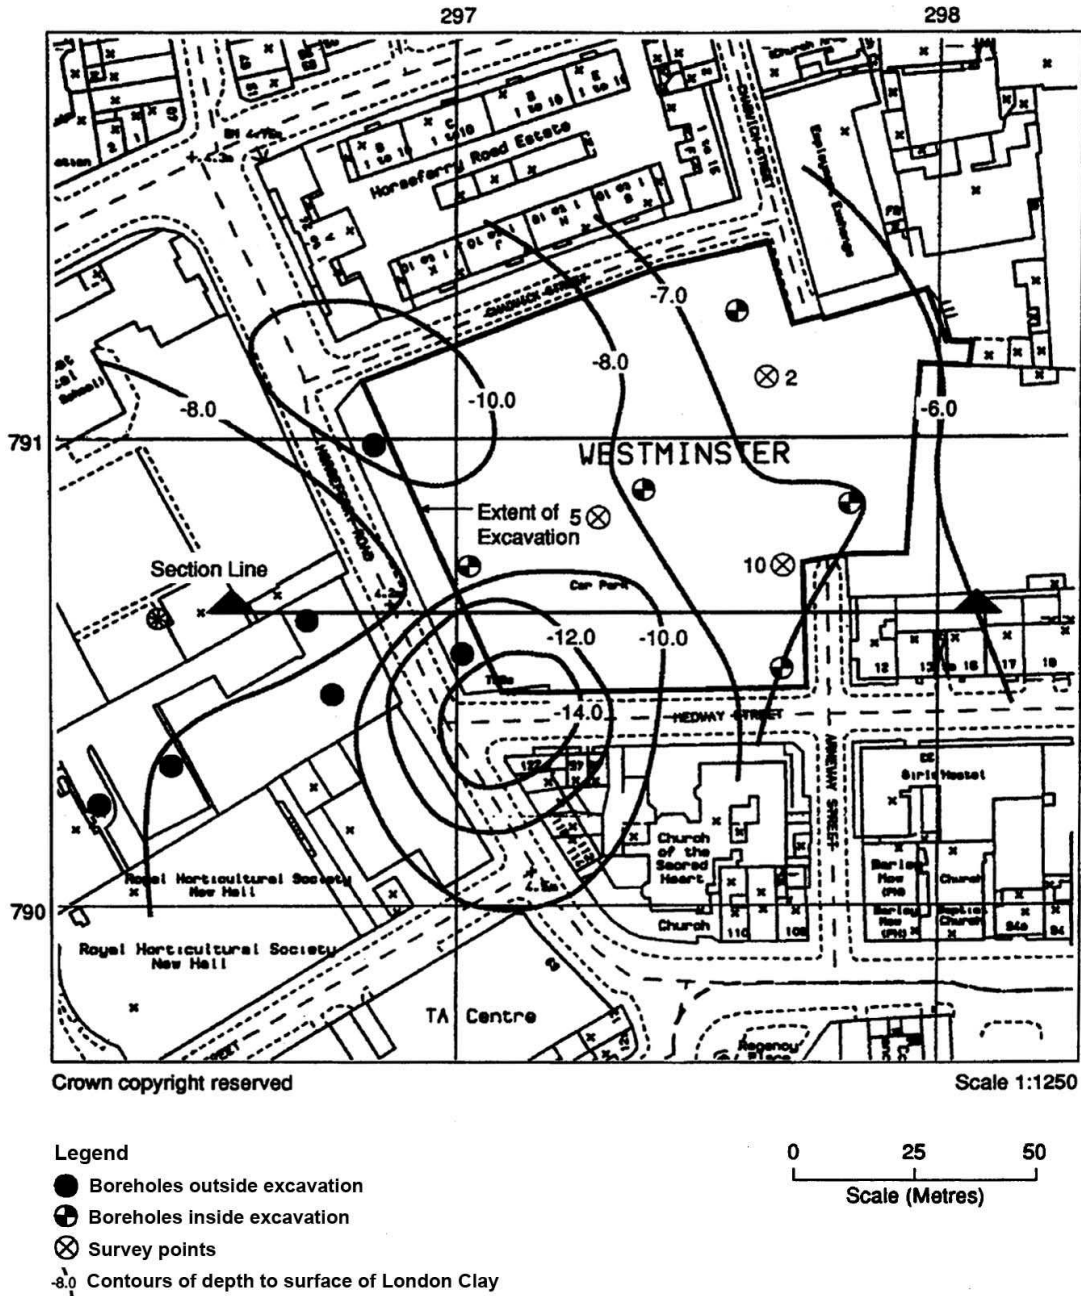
Horseferry Road site plan, after Chapman (1999)
